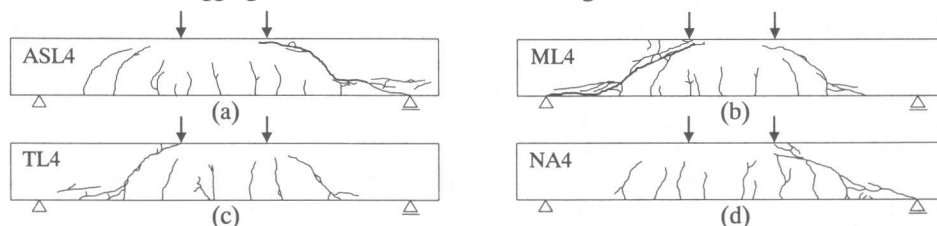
Typical crack pattern of beam specimens ($a/d=3.03$ and $\rho_s=1.6\%$) after failure
